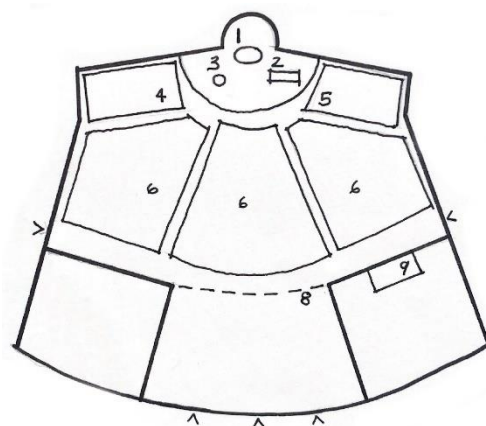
Plan form layout of the Universiteitsoord Church (Author, 2023).
